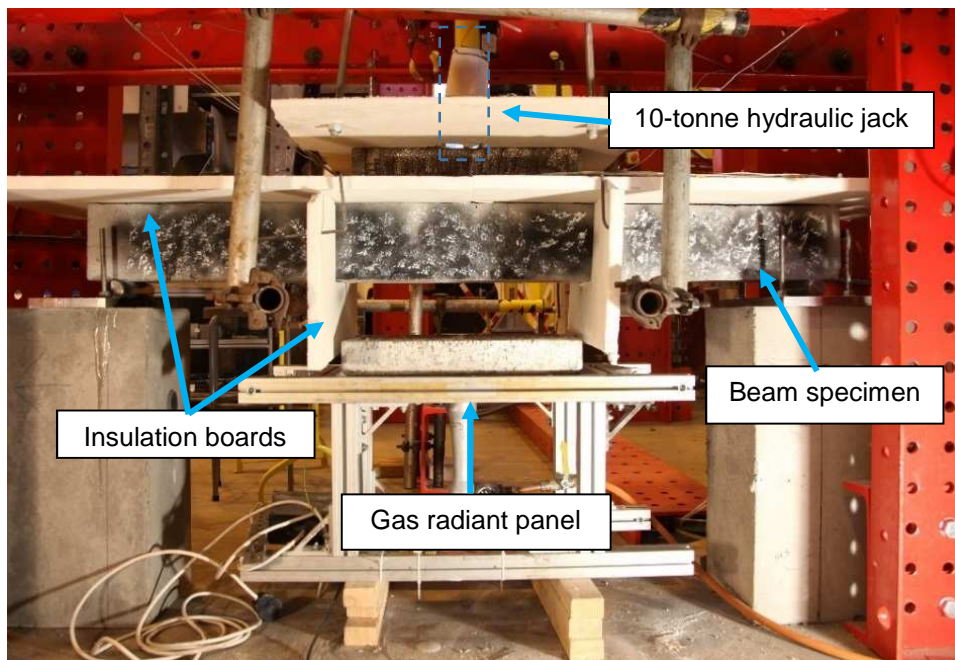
Testing arrangement of four-point bending test with localised heating.
